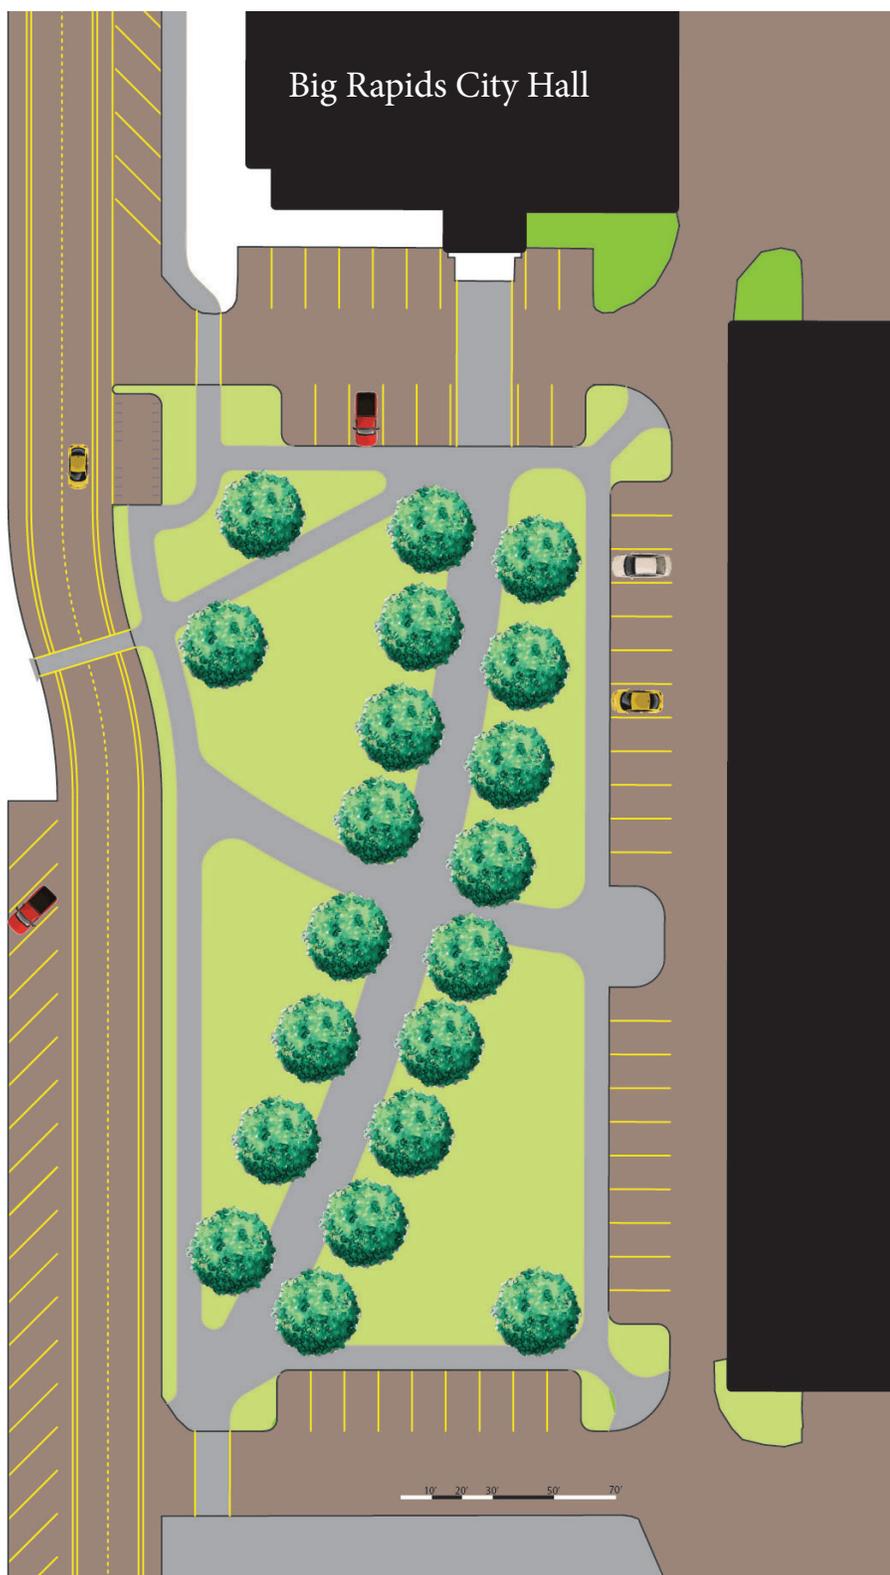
THIS NEW CENTRAL PARK WILL BE LOCATED IN THE PLACE OF THE EXISTING PARKING LOT NEXT TO CITY HALL
